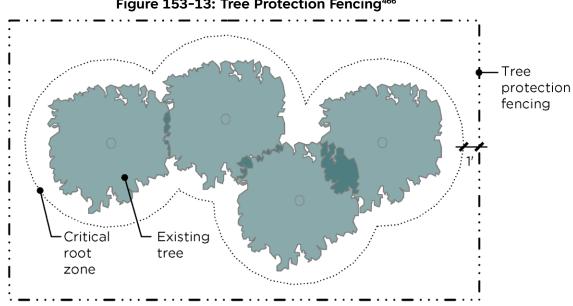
Tree Protection Fencing⁴⁶⁶
